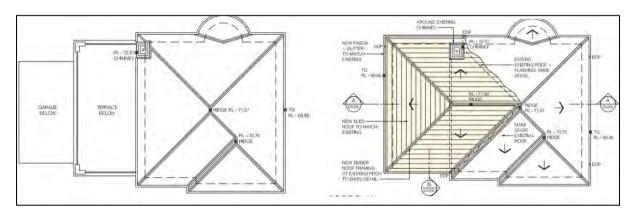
Existing Roof Plan – EX101 A (left) and Proposed Roof Plan – DA102 B (right)
